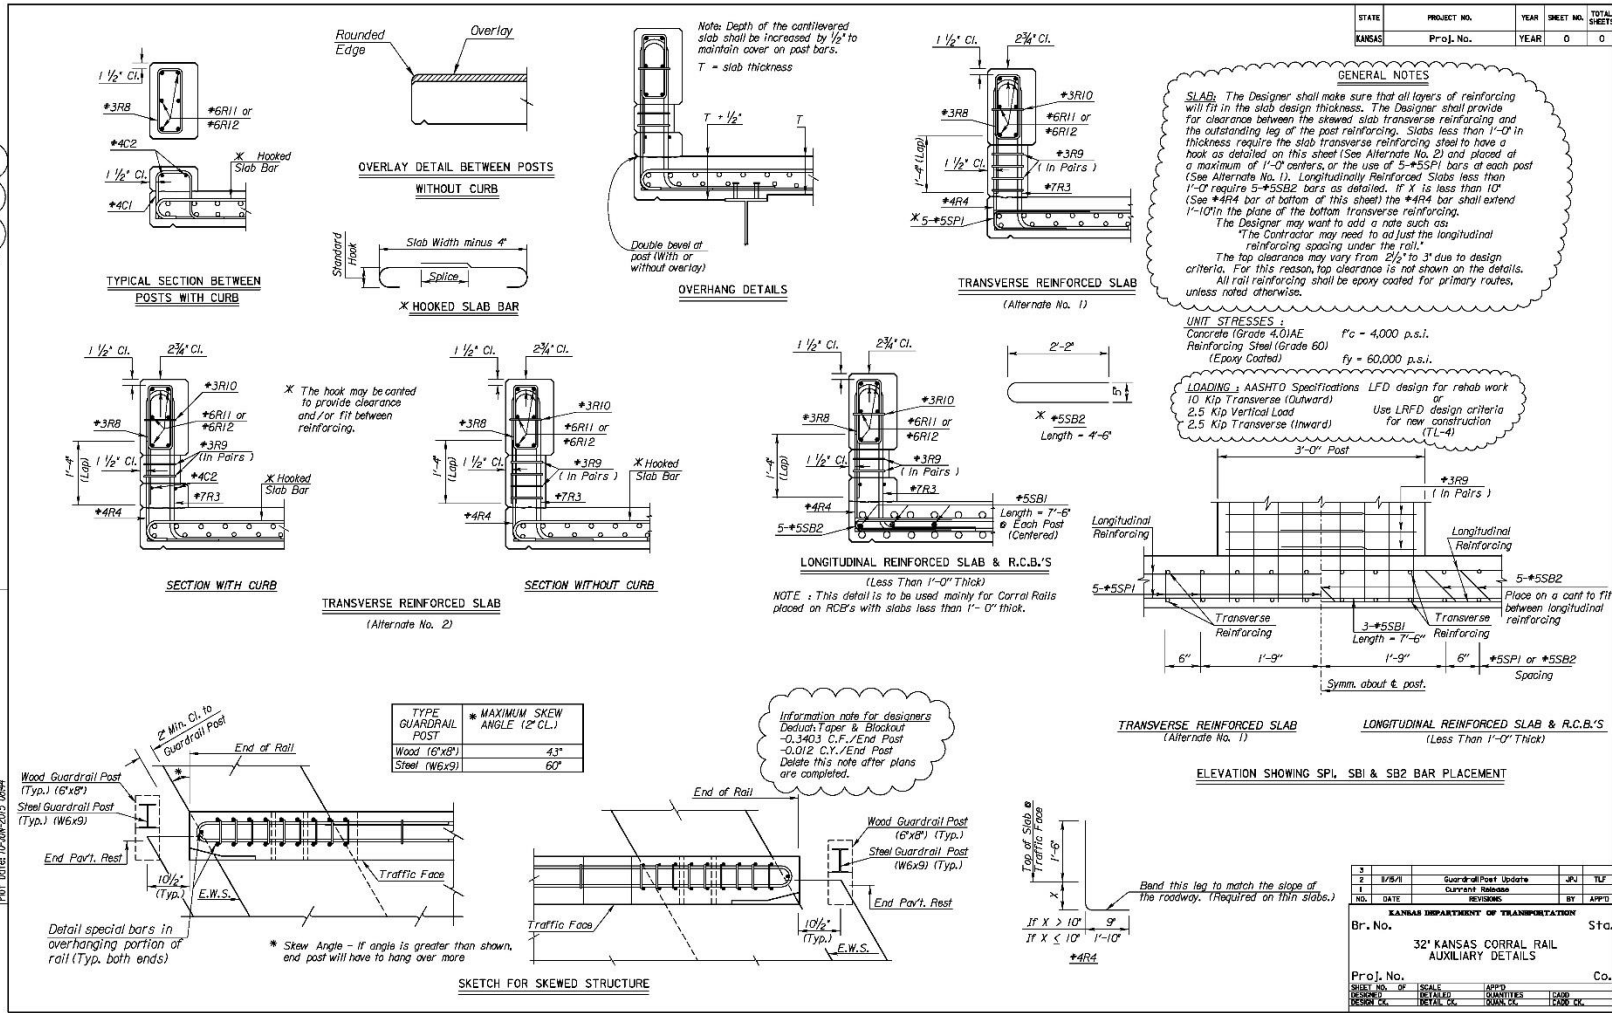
KDOT Open Concrete Corral Rail Details [8]
